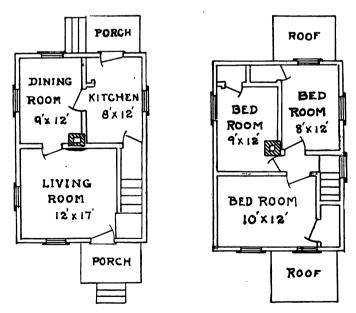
FIRST AND SECOND FLOOR PLANS OF DETACHED FRAME HOUSES FOR MINERS IN ANTHRACITE REGION.
